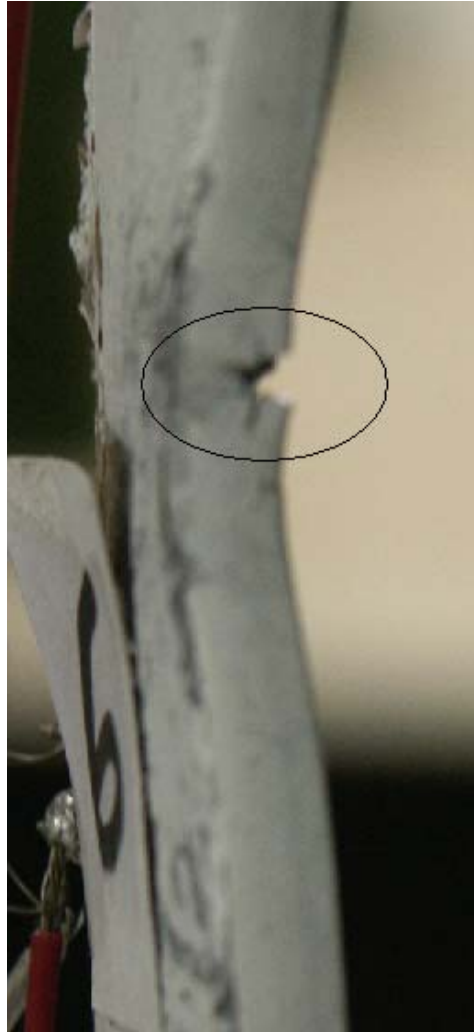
FATIGUE FAILURE CLOSE-UP FROM SIDE, LOAD STEP #12, FIRST CYCLE.
